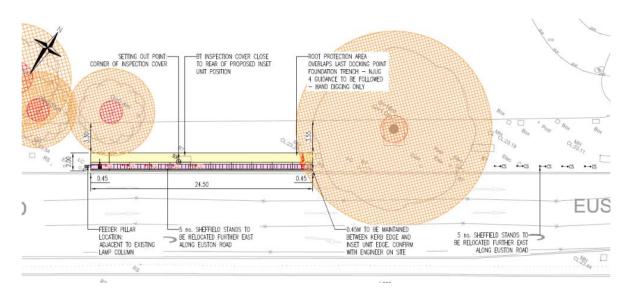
Site plan showing tree for protection and proximity of surrounding trees.
